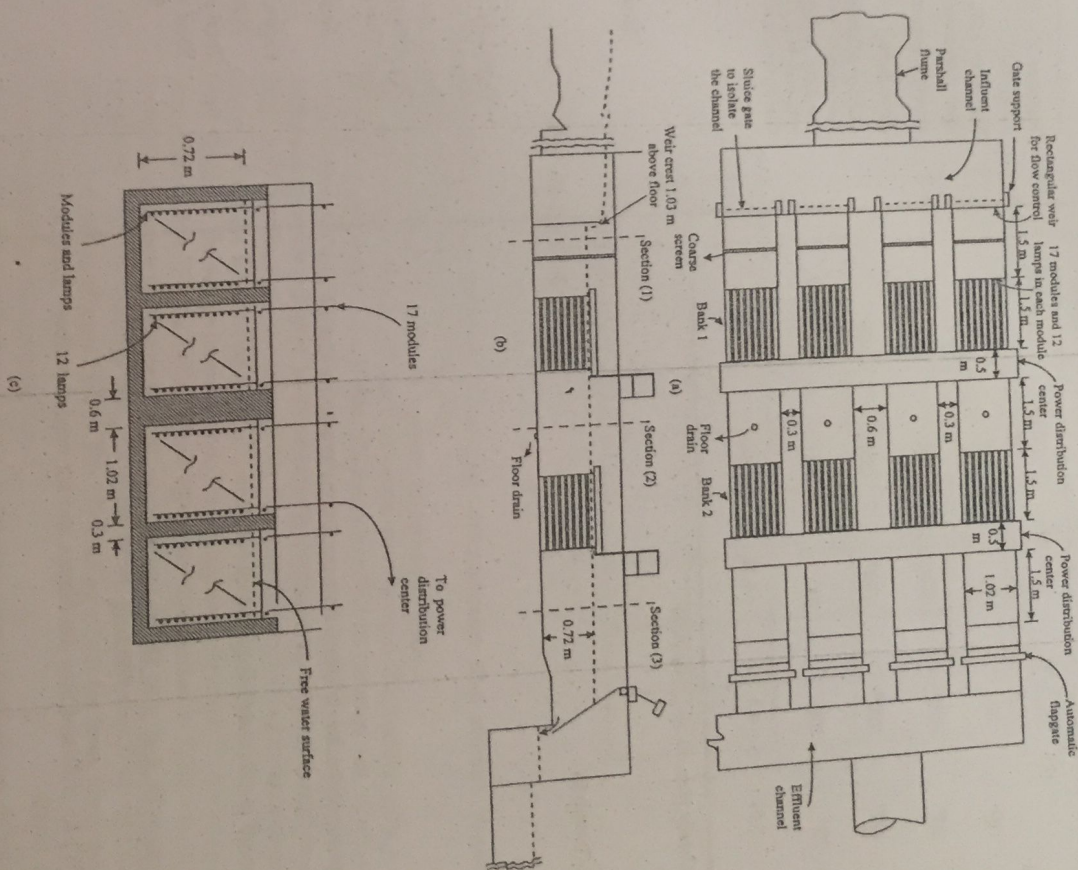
Design Details of the UV System: (a) plan, (b) longitudinal section, (c) cross section.
